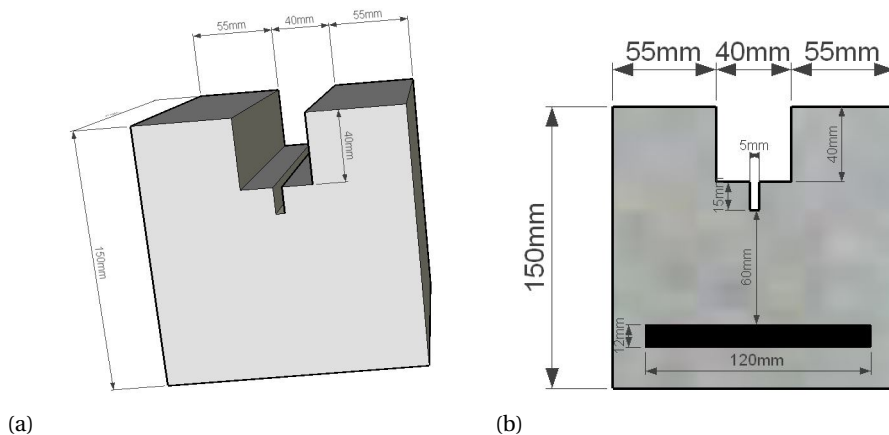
Geometry of the proposed (MWST) specimen in 3D (a) and a cross-section through the reinforcing bar (b)
